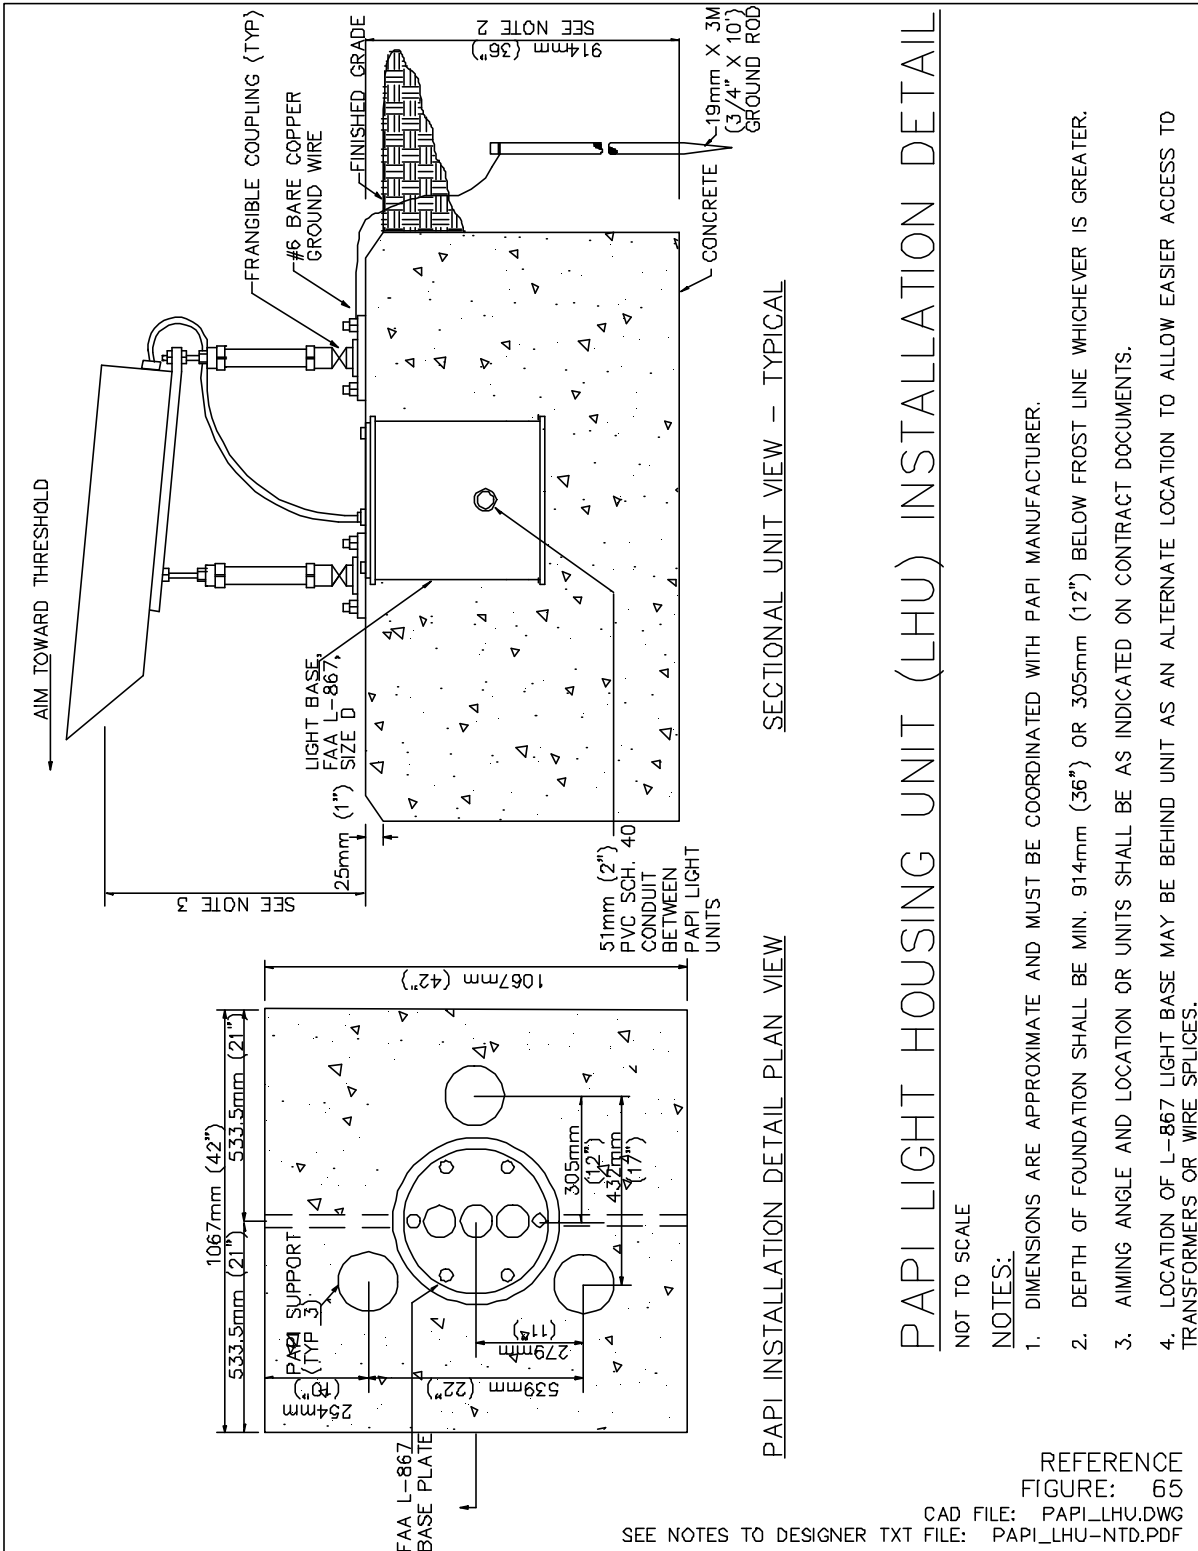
PAPI Light Housing Unit (LHU) Installation Detail
